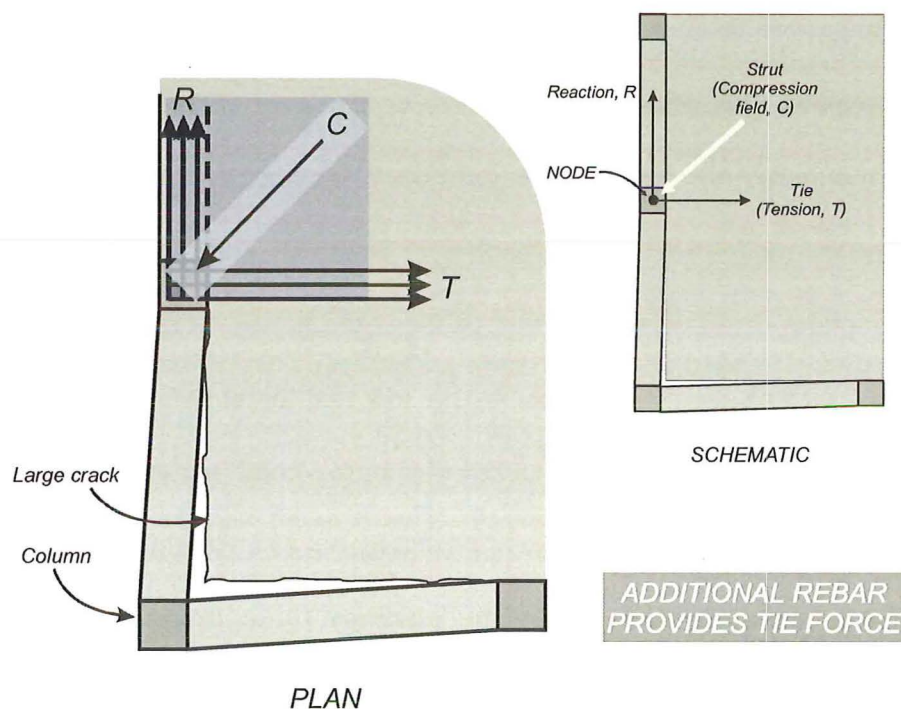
New proposed node for a strut and tie solution within a floor diaphragm
